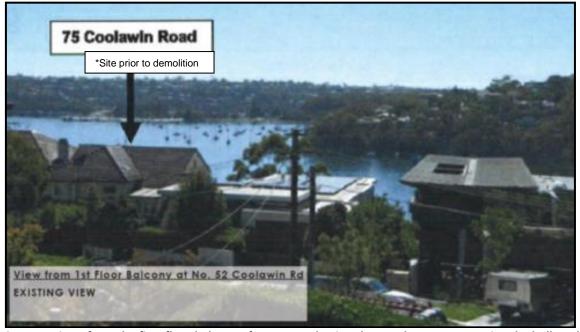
Views from the first-floor balcony of No. 52 Coolawin Rd towards Long Bay, noting the bulk and scale of the previous dwelling and gabled roof
